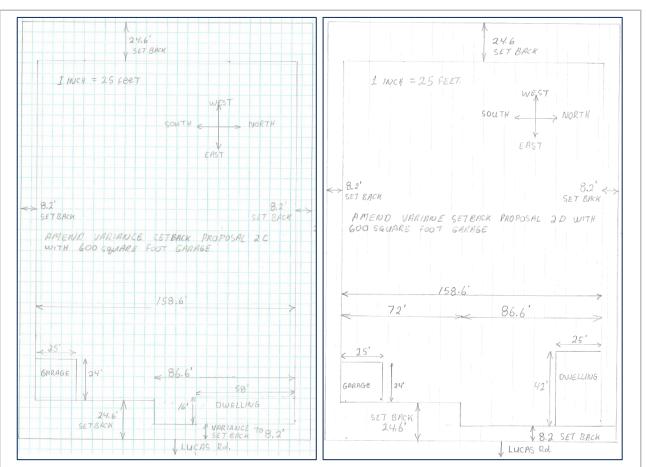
Proposed Site Plan – Option 1 and 2 (indicating possible orientations of the manufactured
